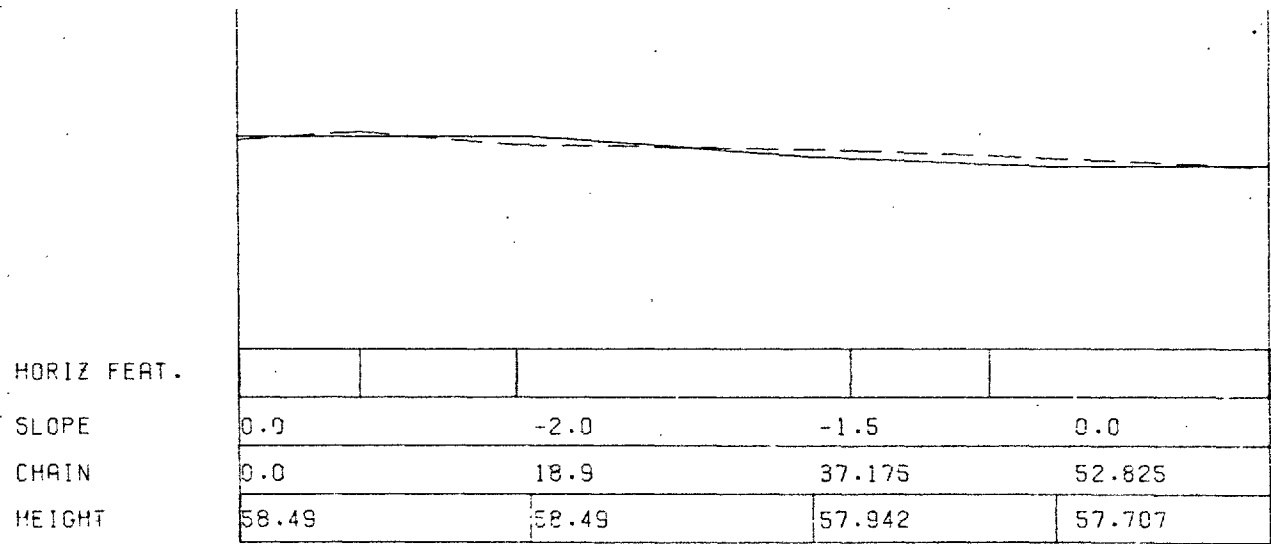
A VERTICAL SECTION THROUGH A ROAD, SHOWING THE ORIGINAL GROUND LEVEL (DOTTED LINE) AND THE FINISHED ROAD LEVEL (SOLID LINE).
